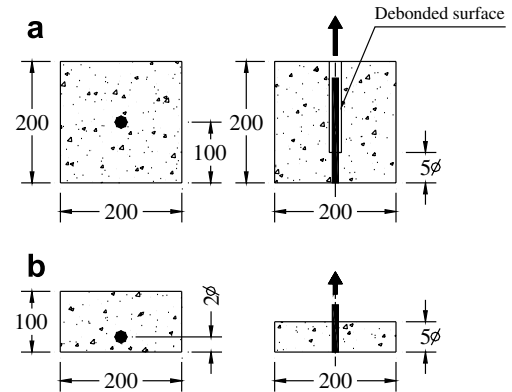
Concrete cubes and the configuration of the specimens: (a) standard pull-out tests, (b) splitting pull-out tests.
